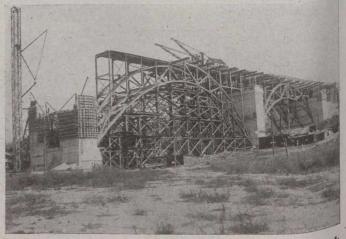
Don Section, Construction View of 240-ft. Arch on Falsework, Connecting Piers B and C. The 158-ft. Arch Connecting Piers A and B is Completed.
